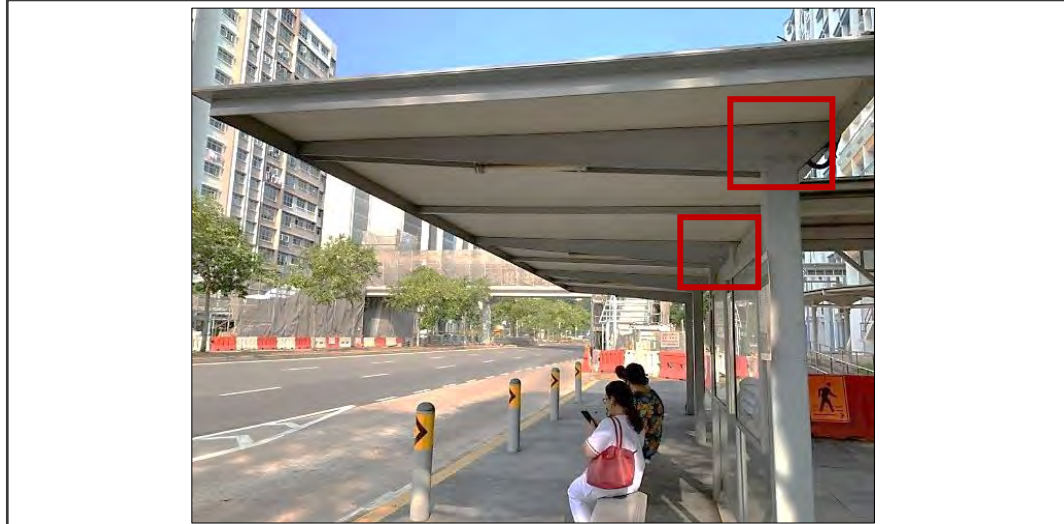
Modularised Design with Demountable Parts (Bolts and Nuts Connection)
